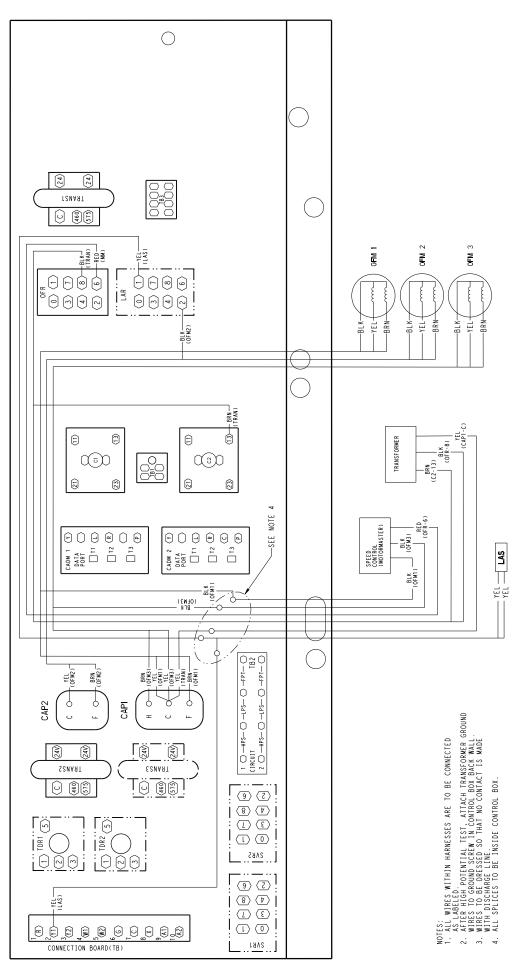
Motormaster Wiring Details: 208/230/460V, 15 Ton Units
